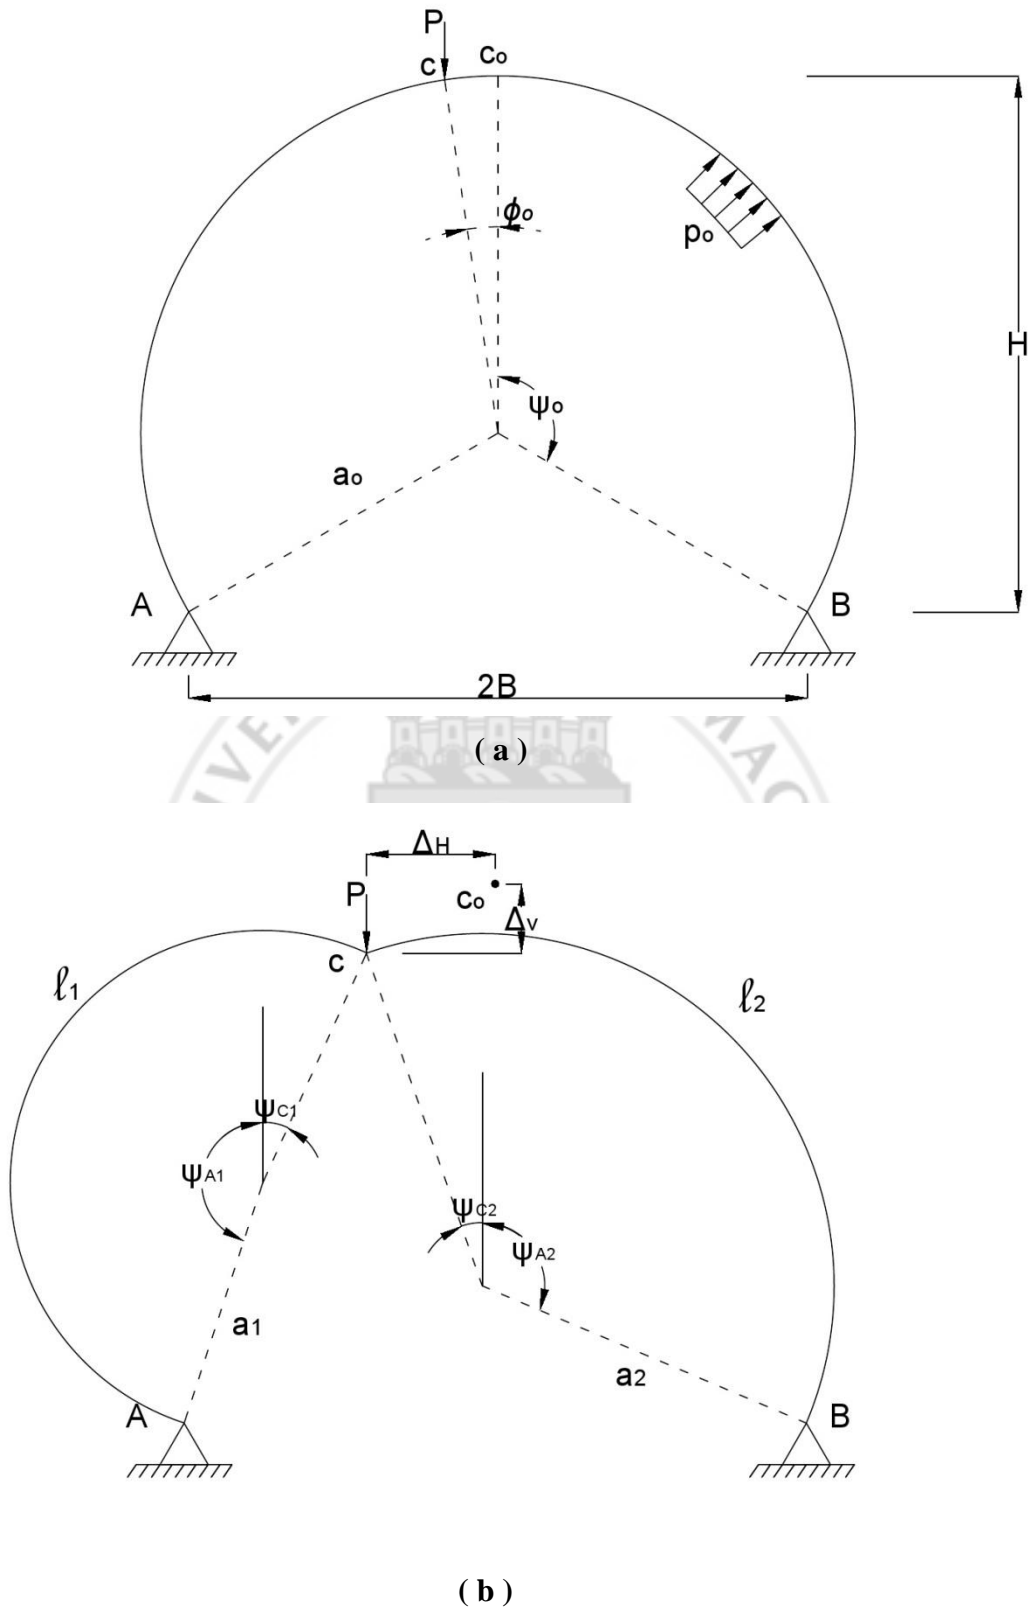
Sectional dimensions of cylindrical air-supported membrane of undeformed shape (a) and deformed shape (b)
